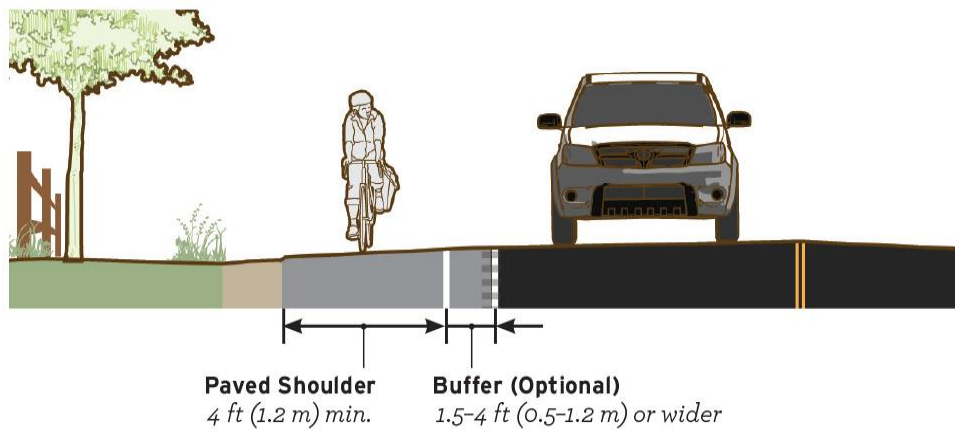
Paved Shoulders Dimensions (AASHTO, 2012).
